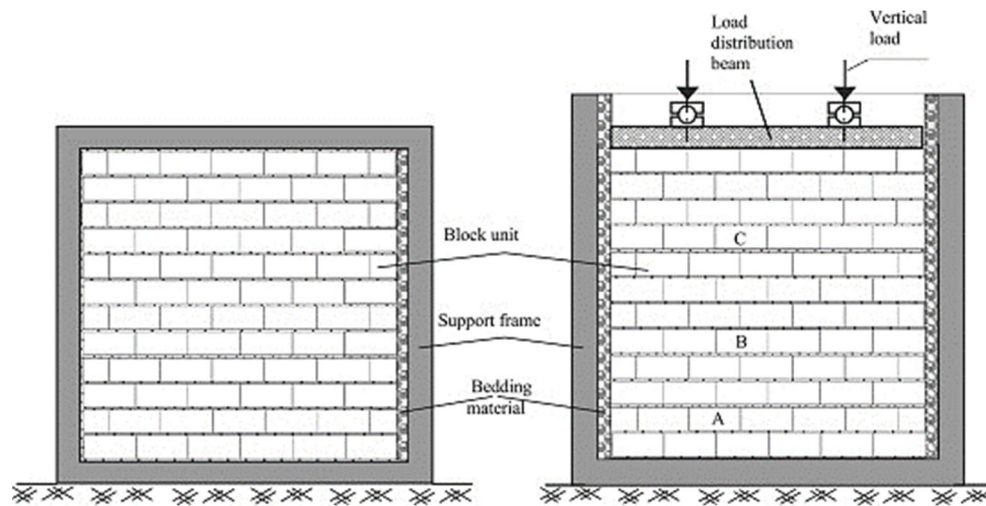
Test setup: Non-load bearing wall (Left), Load bearing wall (Right) as undertaken by Nguyen and Meftah [12]
